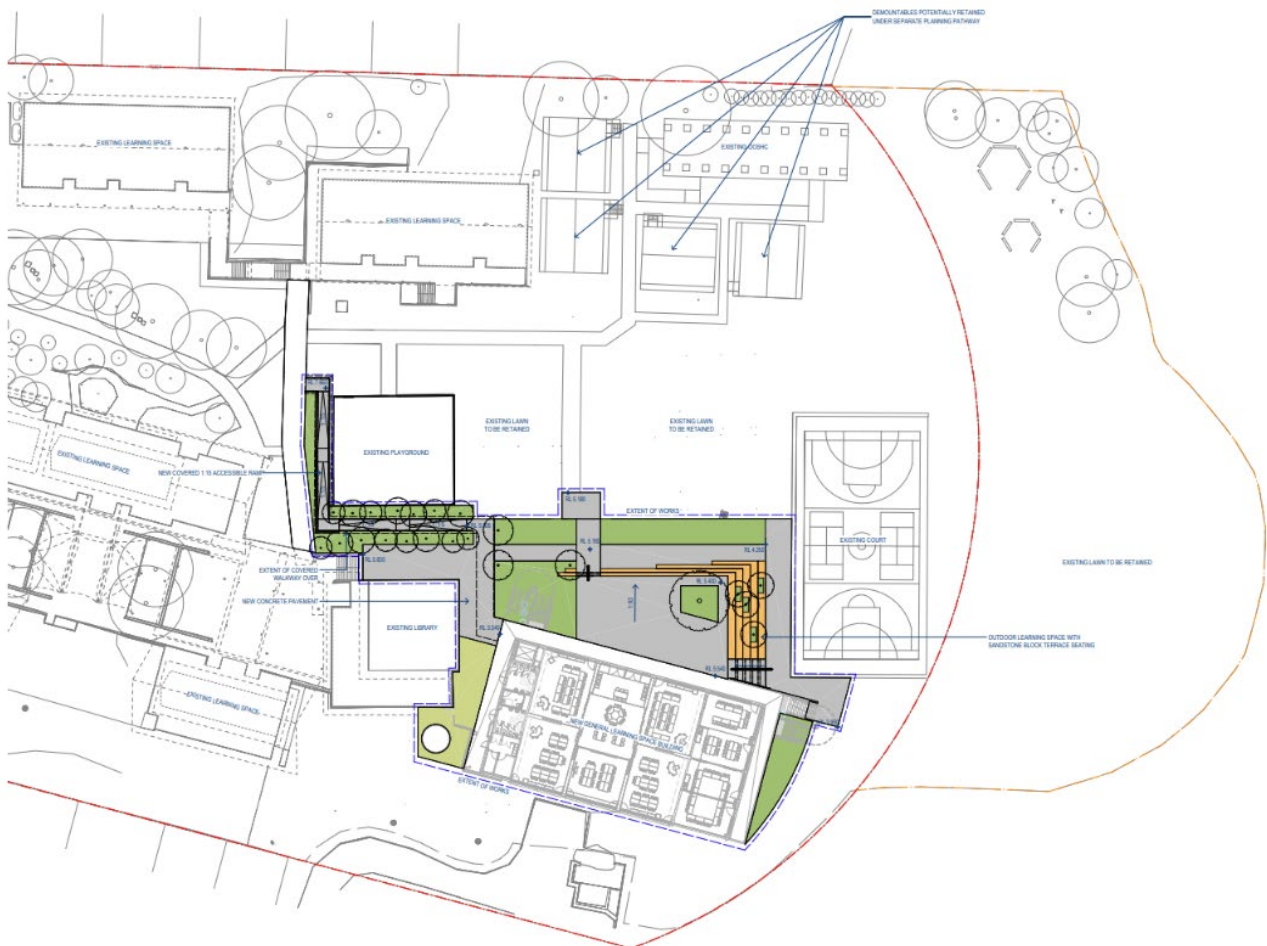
Extract of proposed indicative landscape plan (Source: Architectus)
